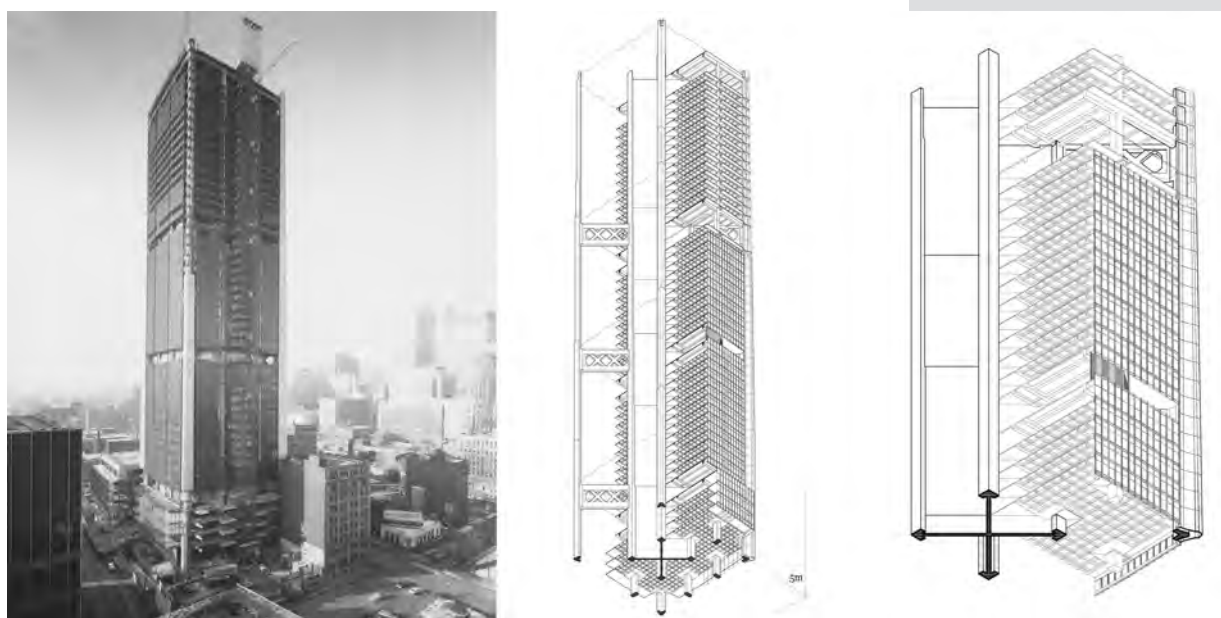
Stock Exchange Tower in Montreal, construction site and “reconstructive axonometries” (drawings by G. Capurso, 2006).
